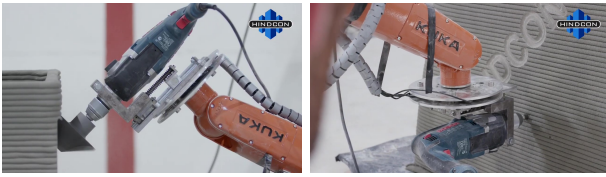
Hindcon: milling freshly 3D printed mortar to improve tolerances change the finish.
